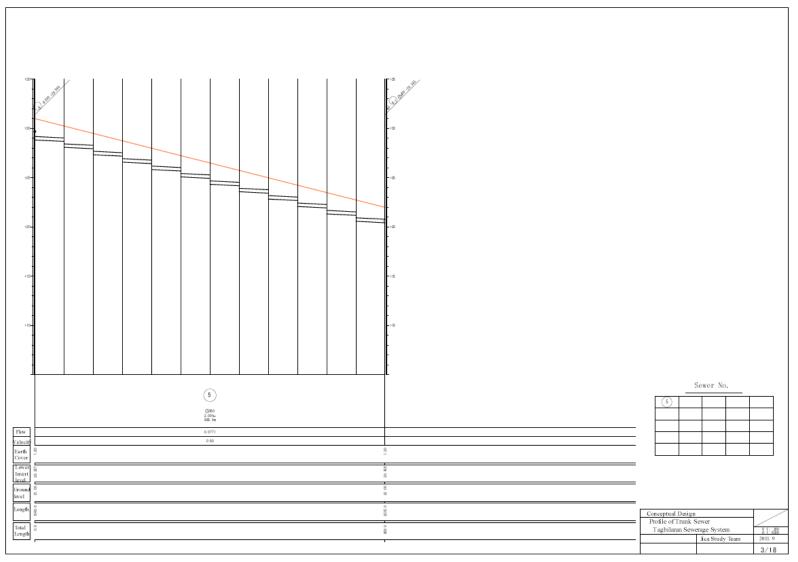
Profile of Trunk Sewer (Tagbilaran Sewerage System)
